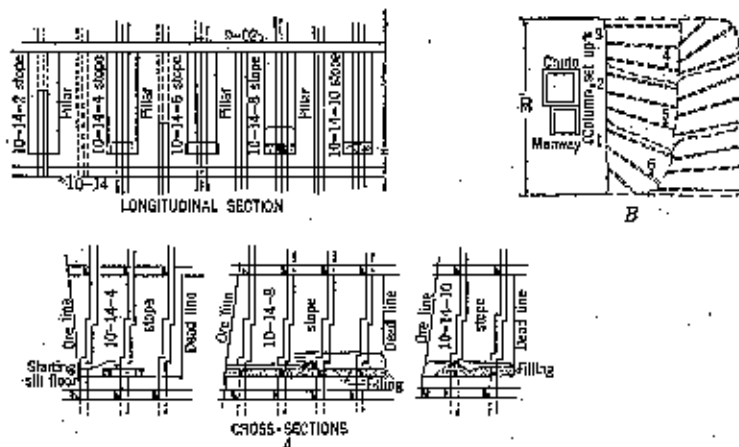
Horizontal cut-and-fill stoping, La Cienega mine: A, Vertical sections showing stoping system; B, method of drilling holes for advancing sill cut.
